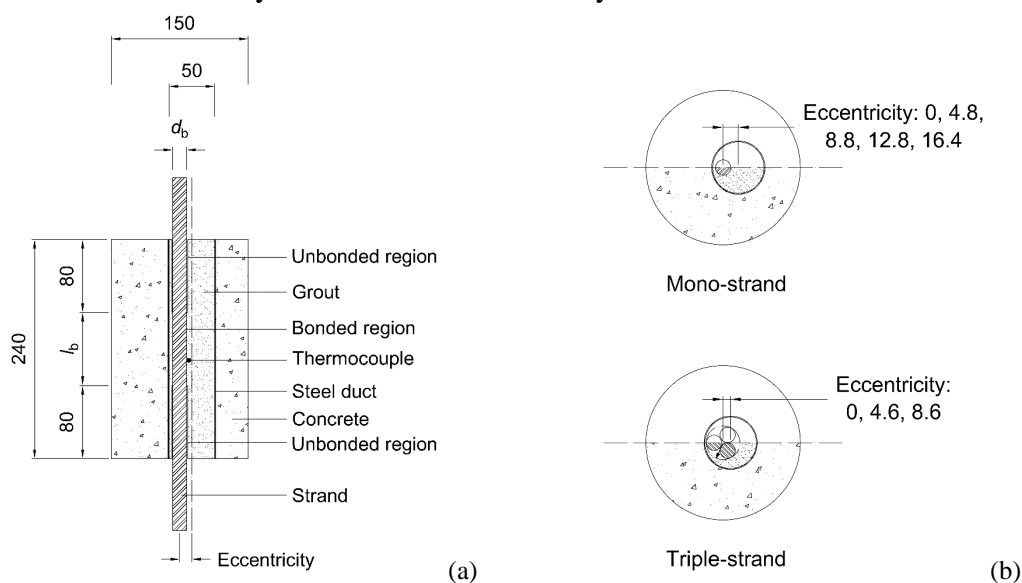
Test specimen (unit: mm): (a) vertical cross section for mono-strand tendon; (b) horizontal cross sections
